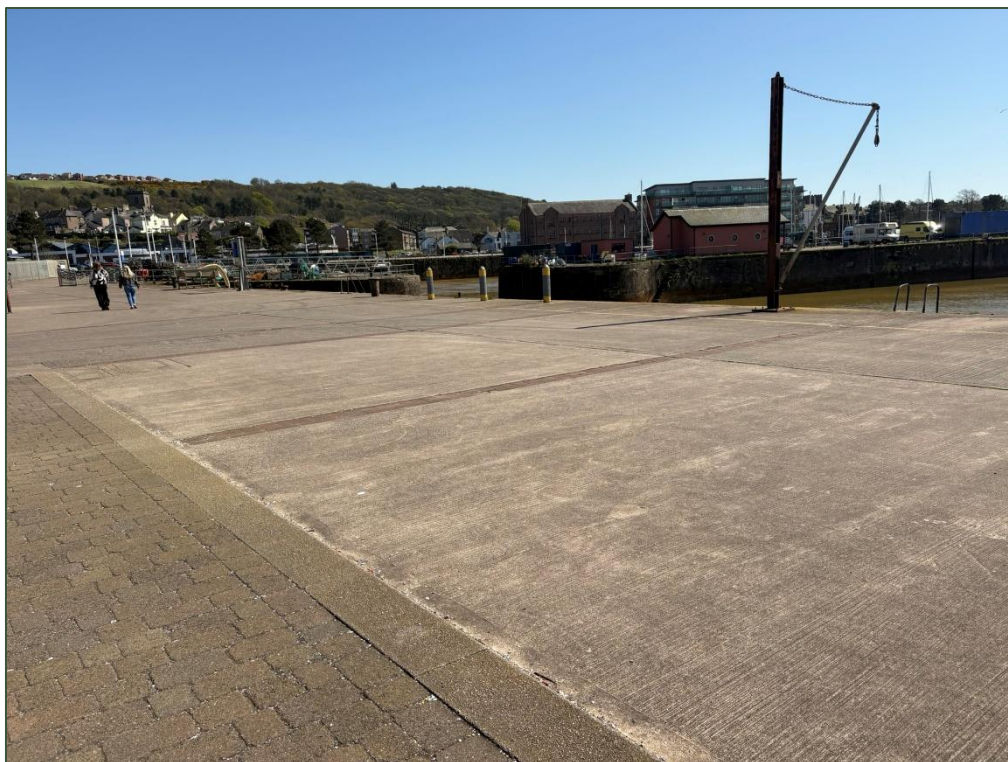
View west of concrete surface of Old North Wall (NHLE: 1038936).
